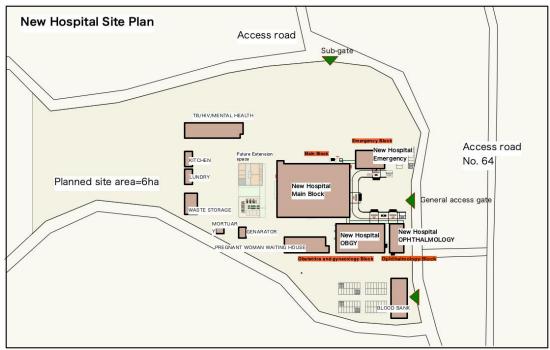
Stung Treng Provincial Hospital Site Plan
